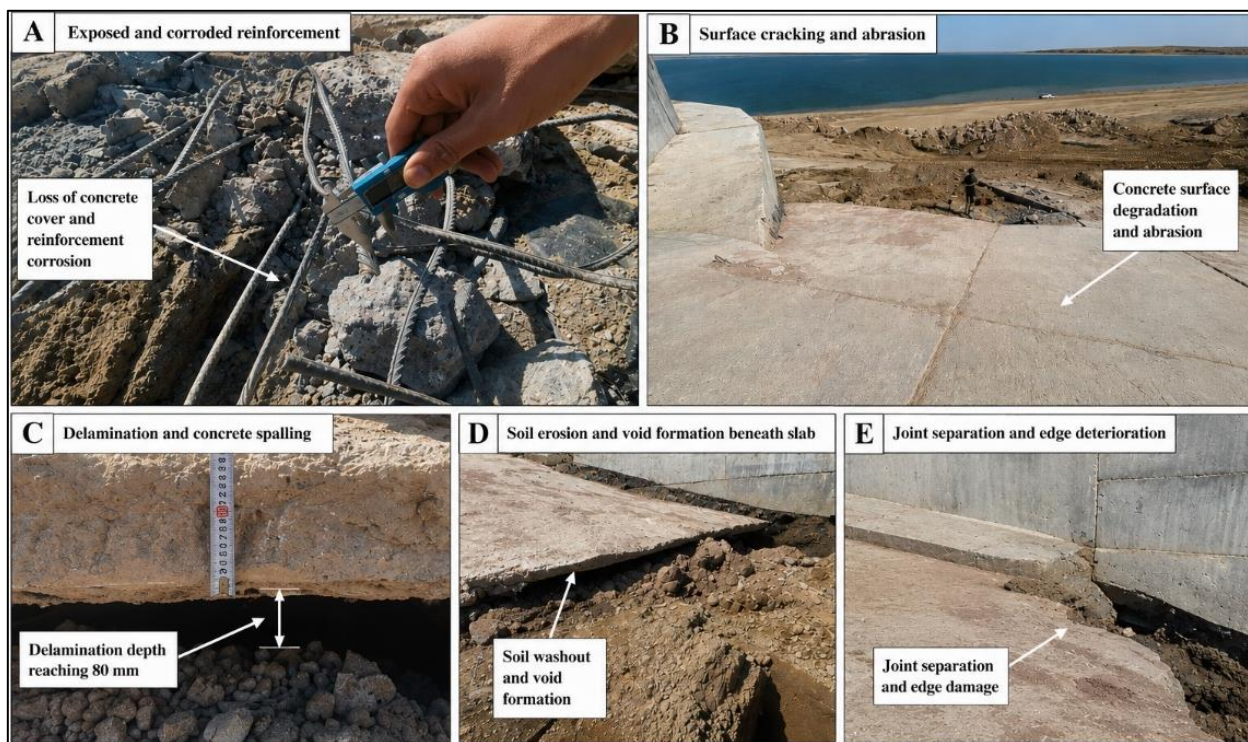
Typical deterioration defects identified in concrete structures during inspection of the Tasotkel Reservoir emergency spillway: (a) exposed and corroded reinforcement; (b) surface cracking and abrasion; (c) concrete delamination and spalling; (d) soil erosion and void formation beneath slab; (e) joint separation and edge deterioration (authors' material)
